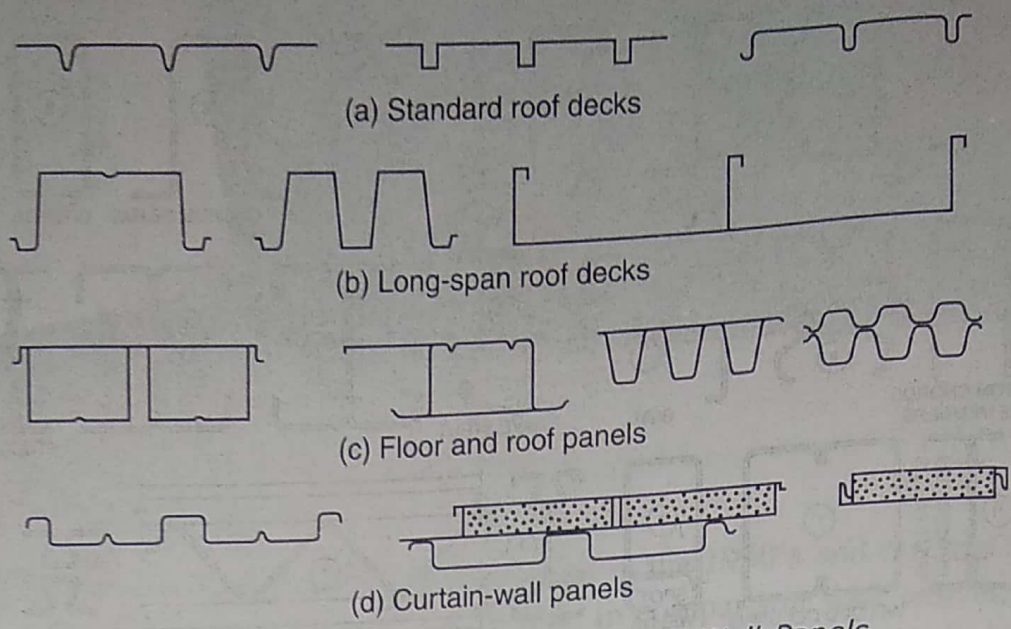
Floor and Roof Decks, and Wall Panels
